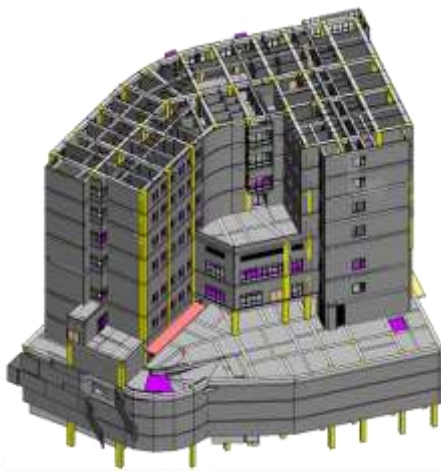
3D BIM modeling of San Chung Hospital, New Taipei City, Taiwan
